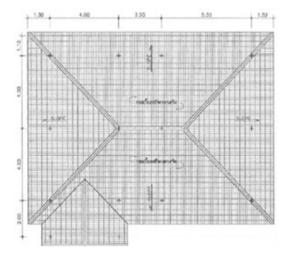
Roof plan (The Department of Public Works and Town & Country Planning of Thailand, 2015).
